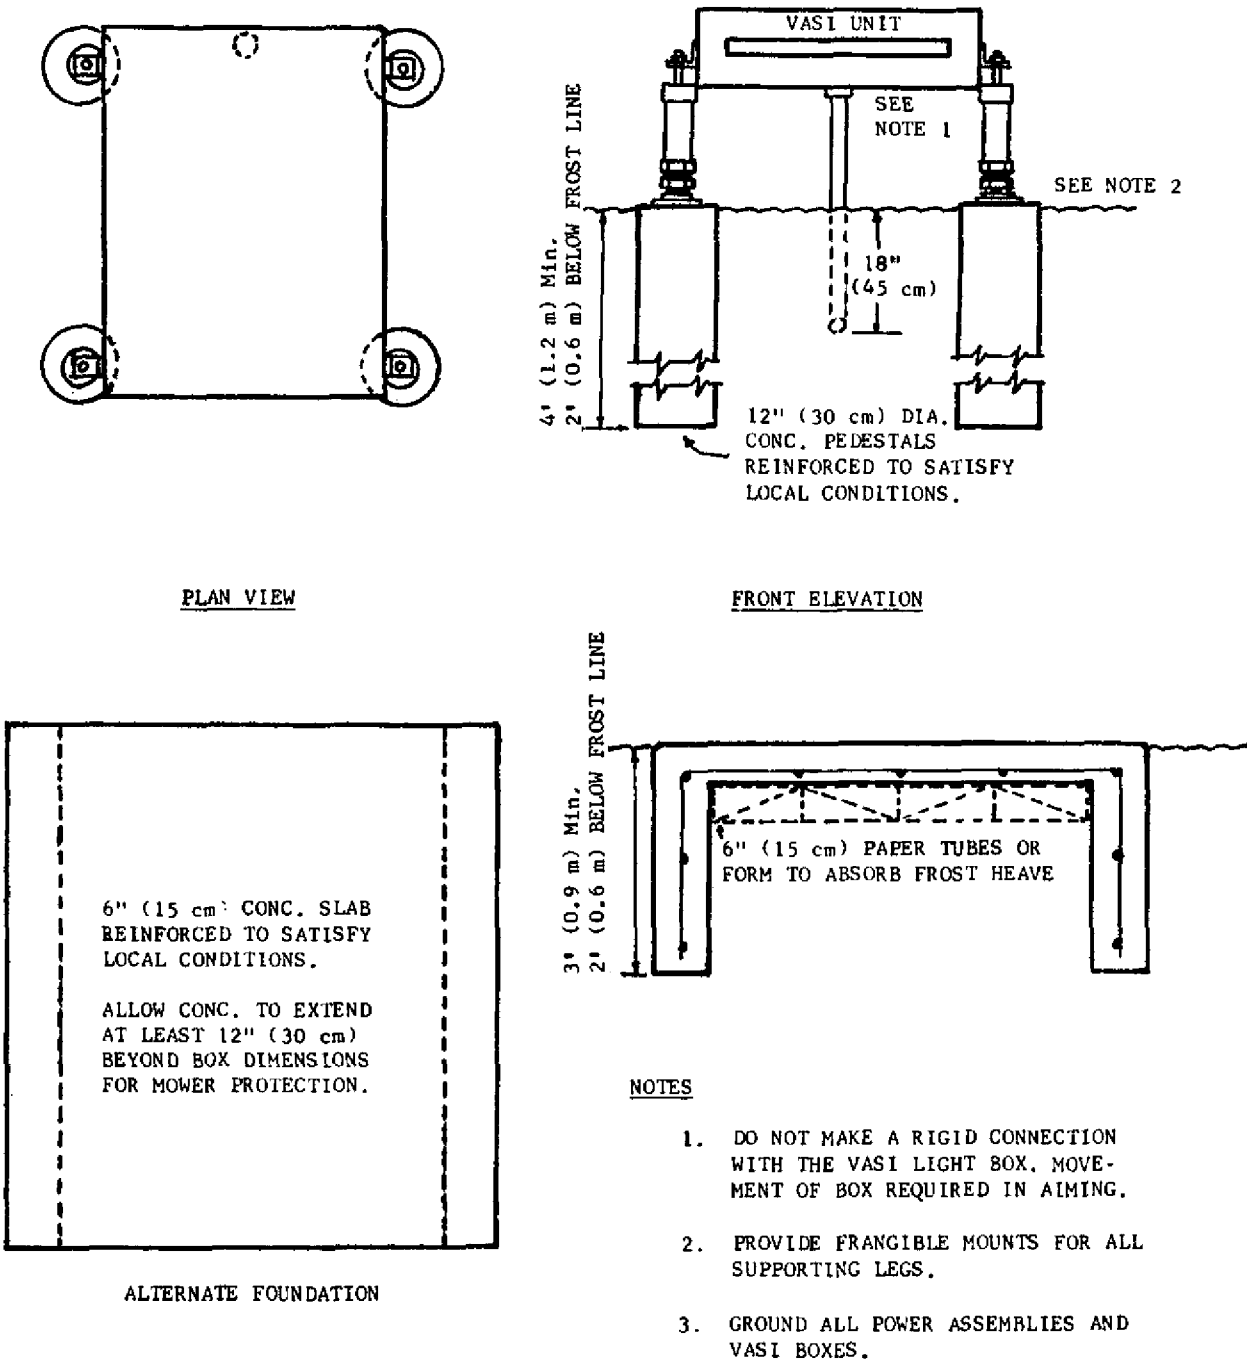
TYPICAL INSTALLATION DETAILS OF A VASI LIGHT UNIT.
